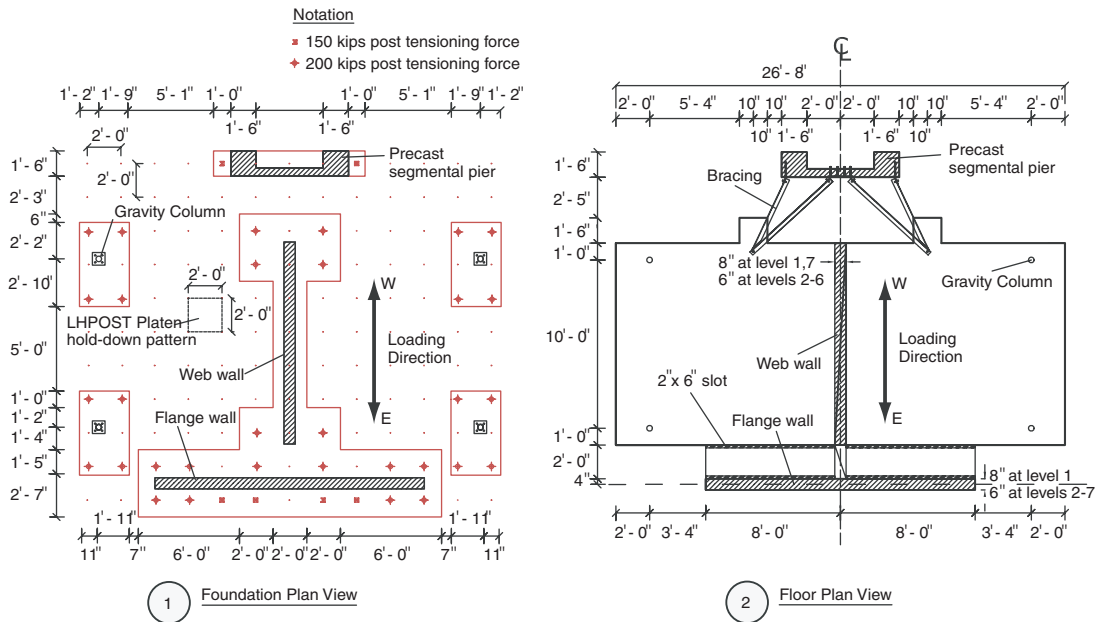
Foundation and typical floor plan of the specimen (U.S. customary units).
